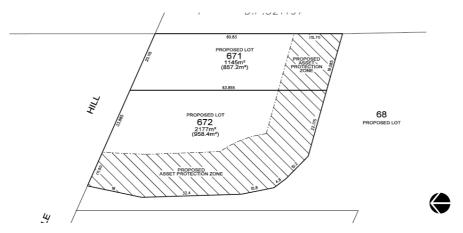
Indicative subdivision plan of northern site (Castle Hill Road) Source: Rygate Surveryors
